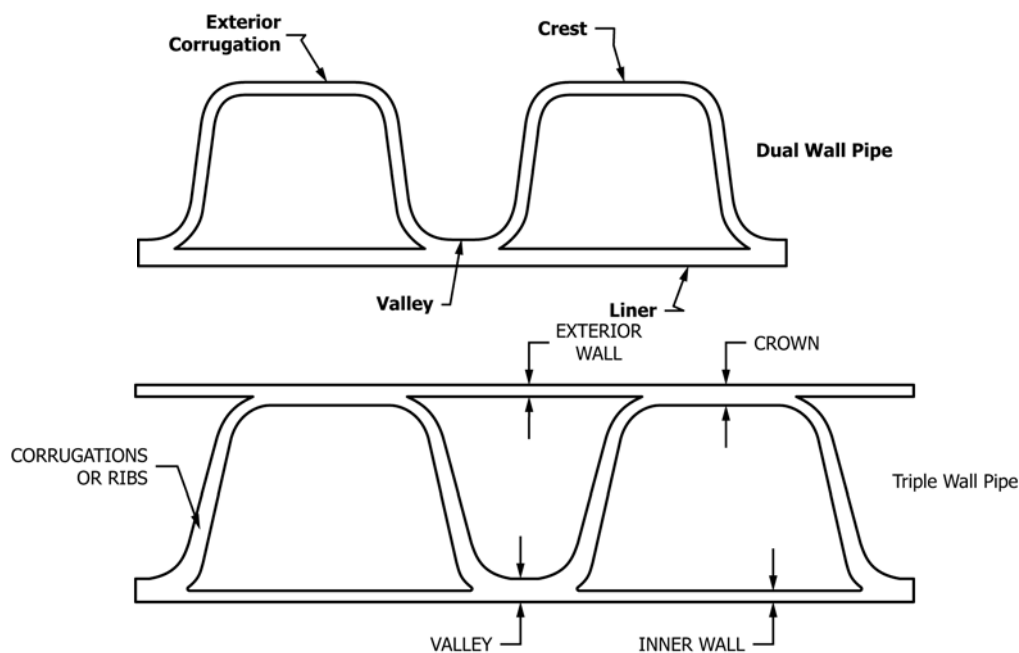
Typical Dual and Triple Wall Pipe Profile
